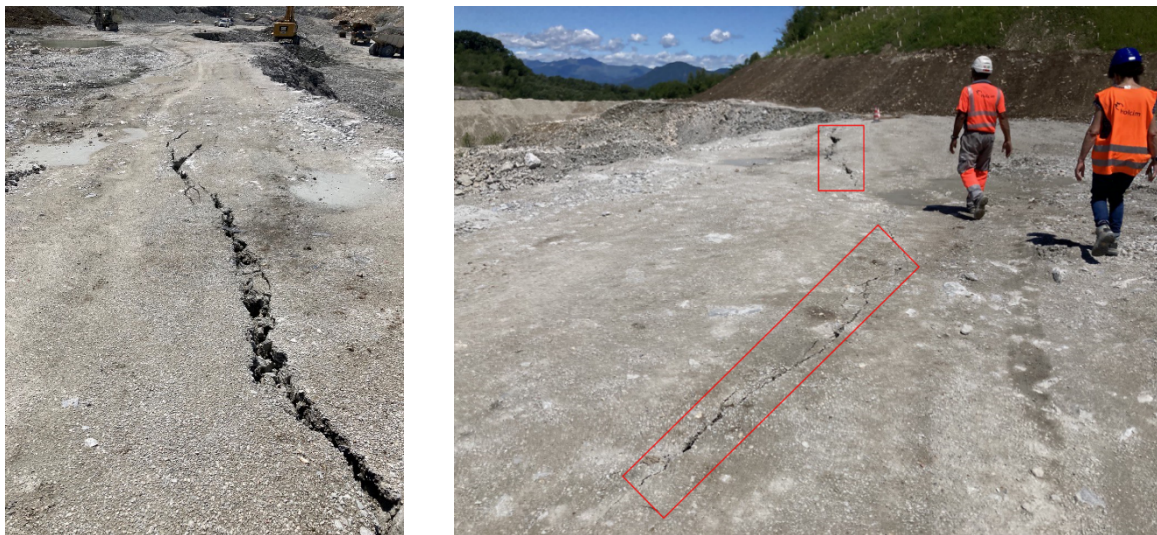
Example of tension cracks formed at the edge of the bench after blasting.
